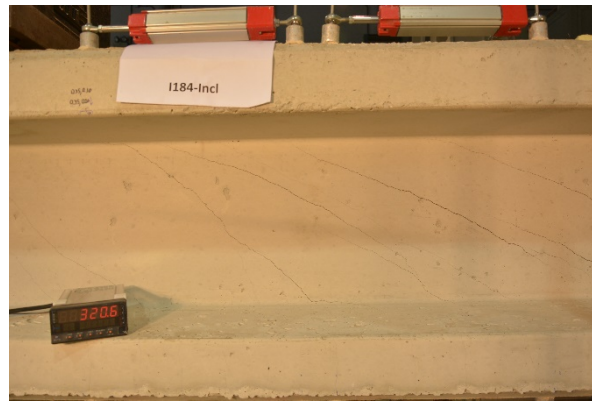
Shear cracks in the web of a prestressed concrete beam (Celada 2018)
